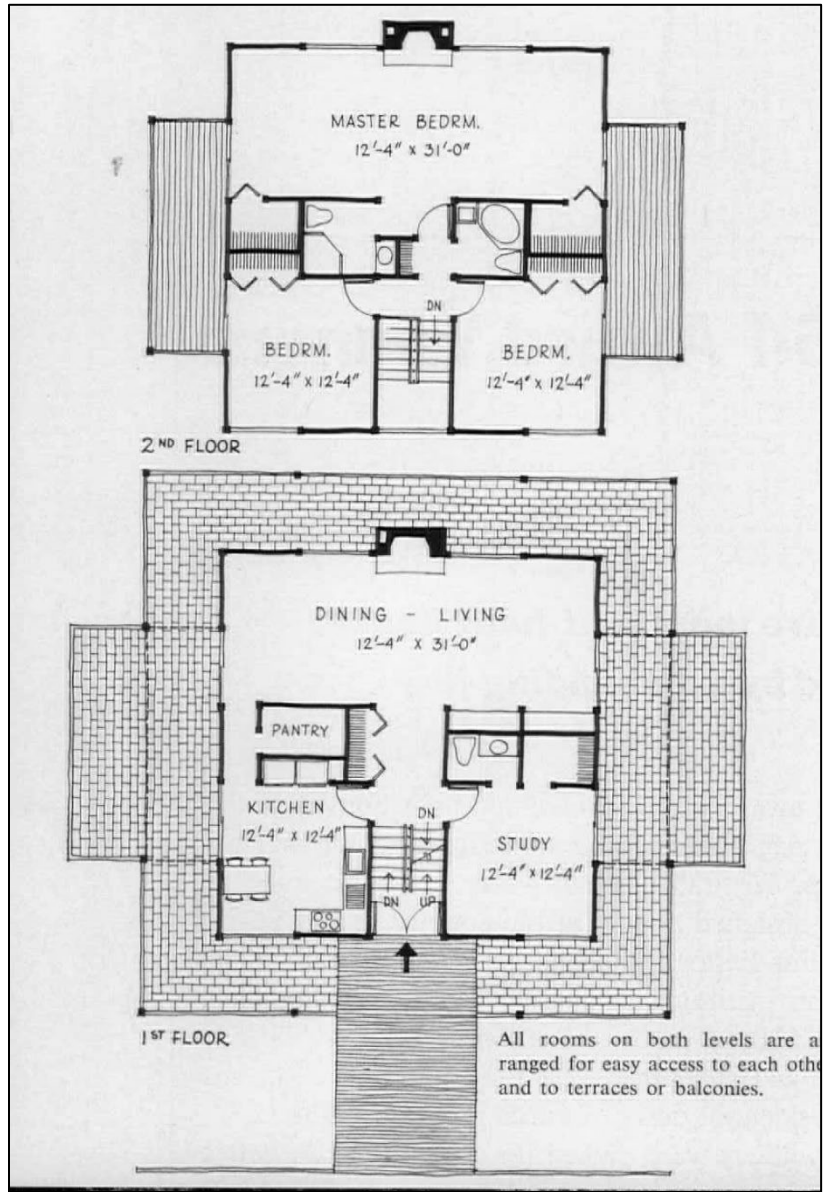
Plan of the System House, 128 Chichester Road, as published in *House & Home*.
